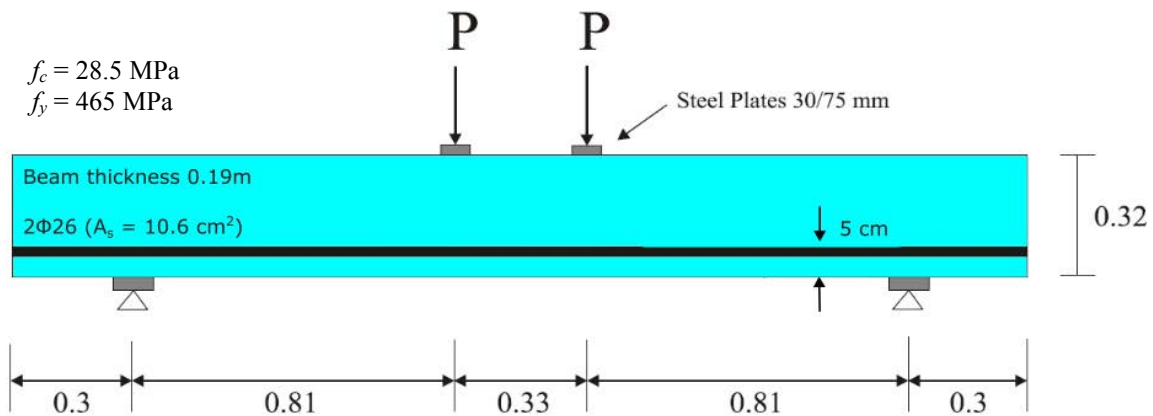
Leonhart's shear beam. Geometric and reinforcement details (adapted from [3]).
